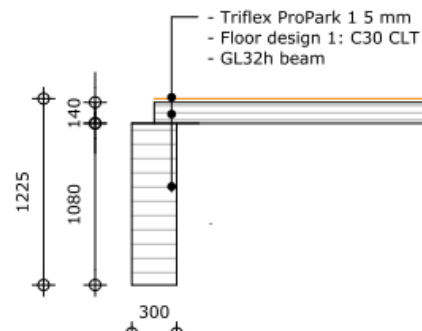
Floor design 1 glulam beam detail cross-section A-A in mm
